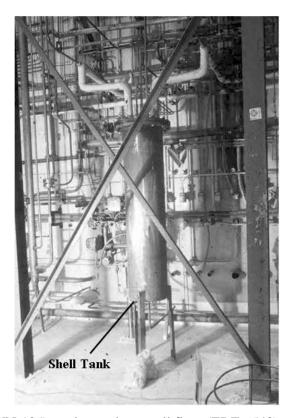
Shell tank (VES-WN-125) on the north gas cell floor (EDF-6543).
